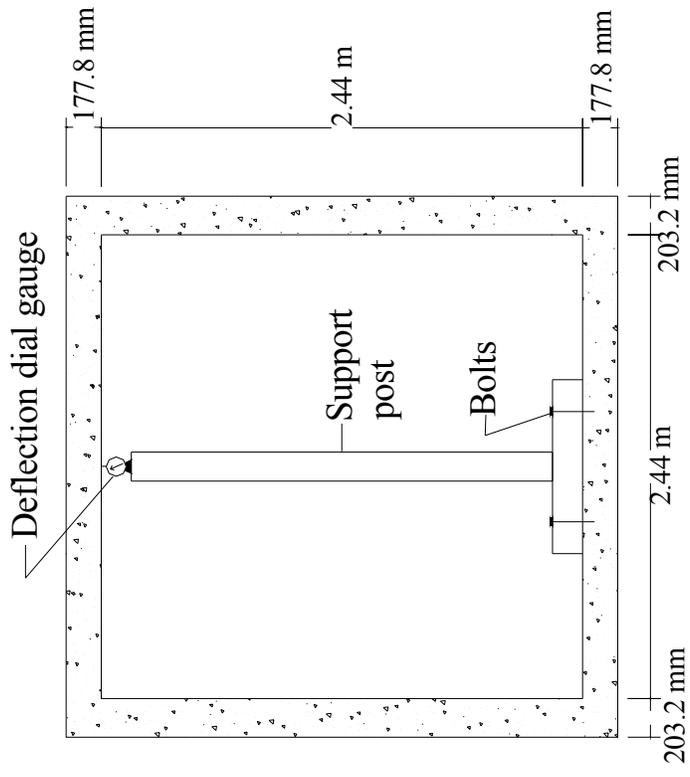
Culvert slabs and wall thicknesses and dial gauge mounting (after James et al., 1985)
